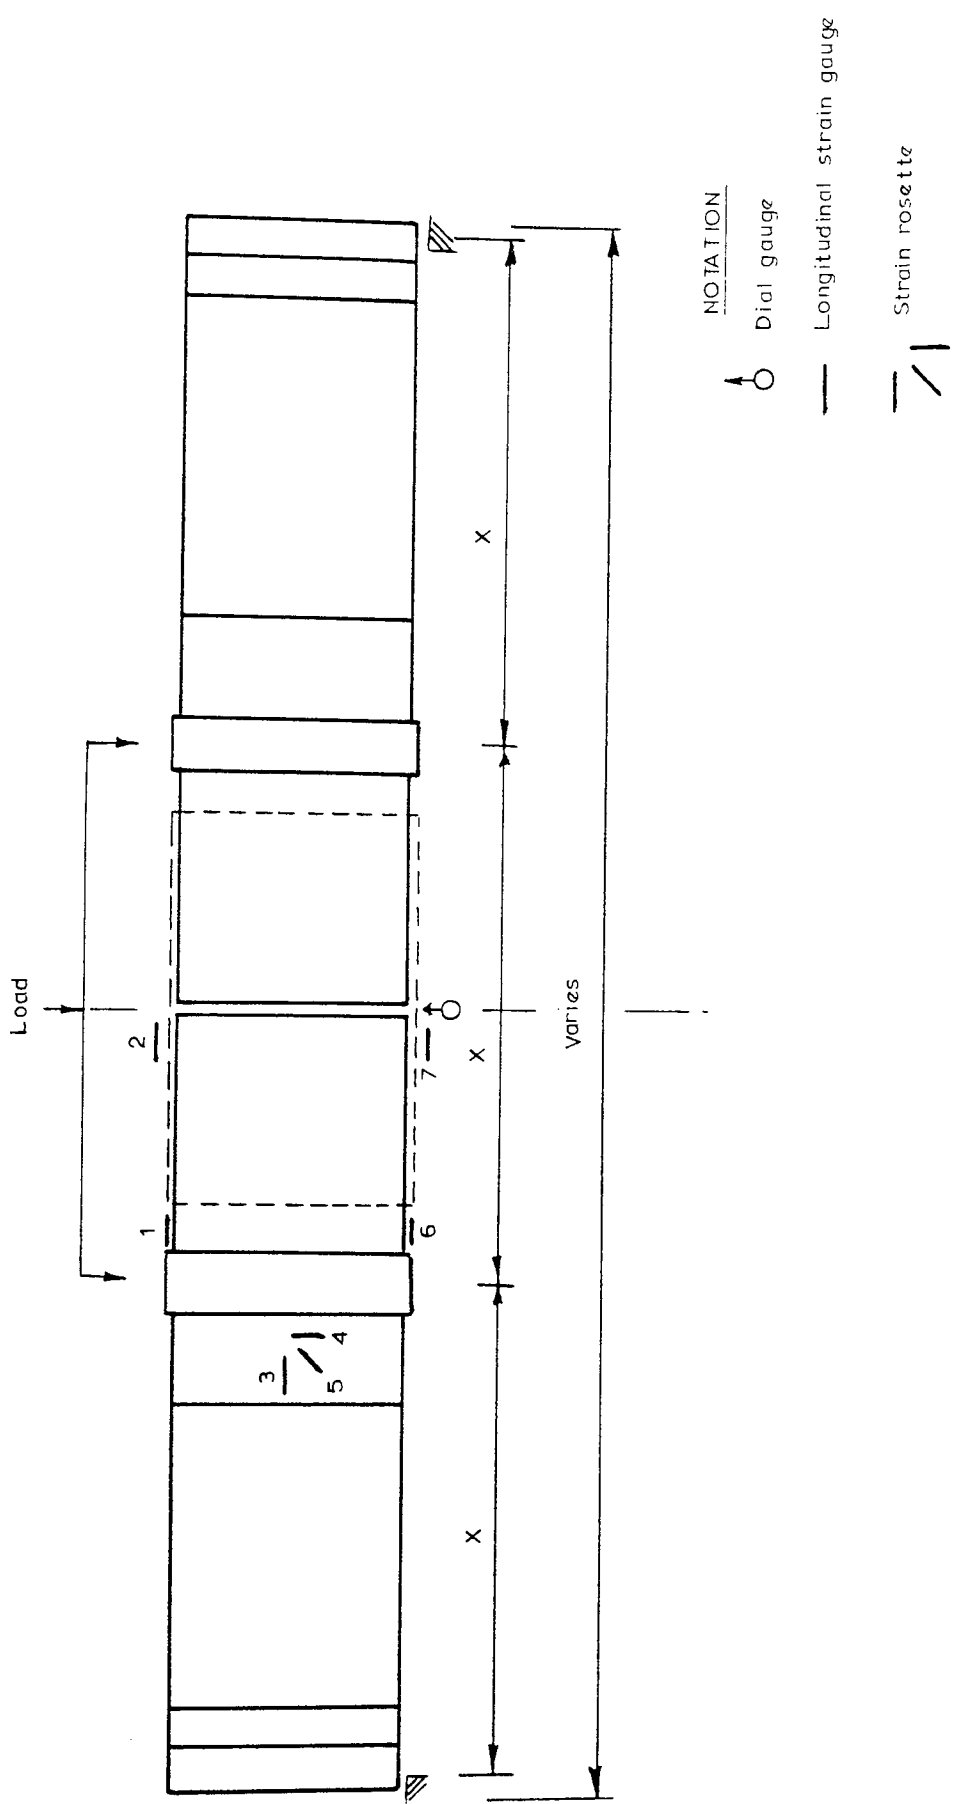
Beams C1 - C4 assembly and instrumentation
